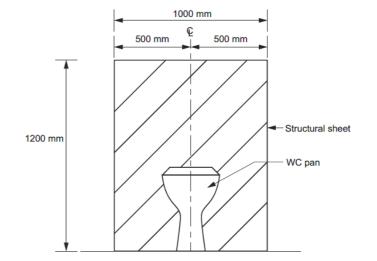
Location of sheeting for a wall behind a toilet pan
